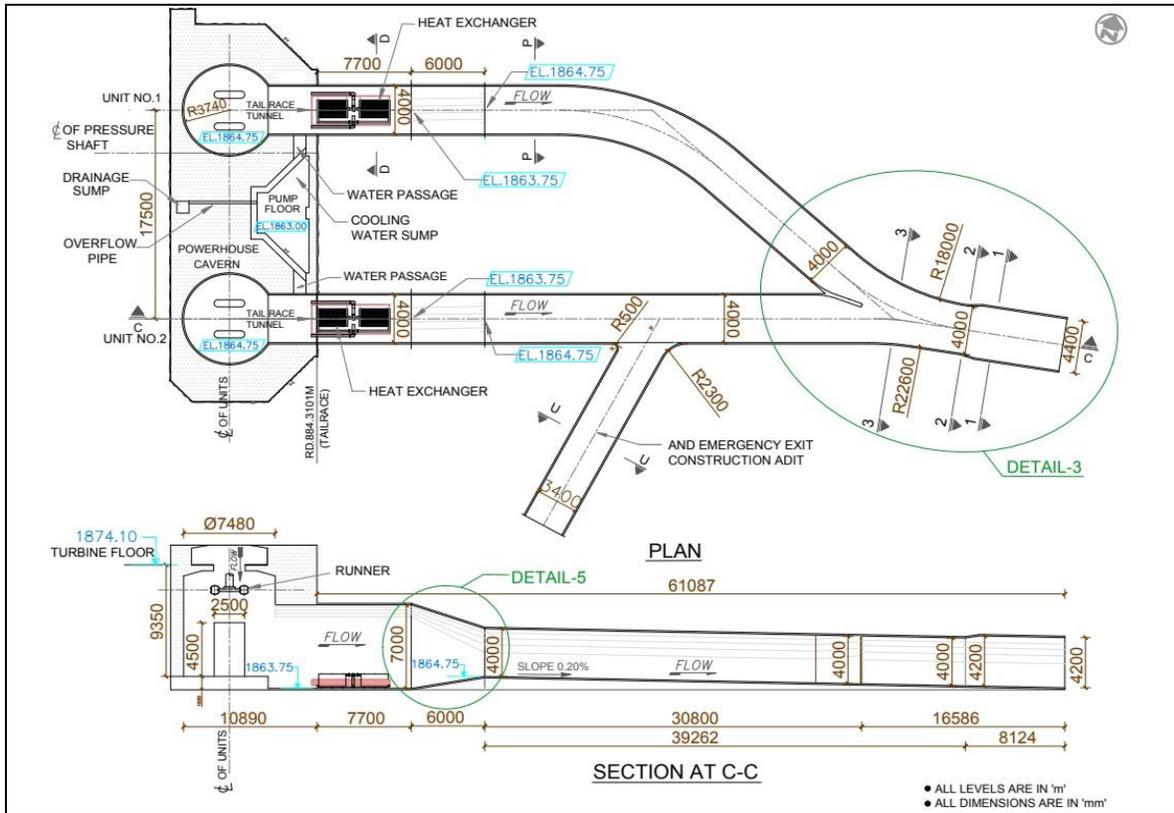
Layout plan and longitudinal section of Cooling water system arrangement in the tail race tunnel at the HPP
